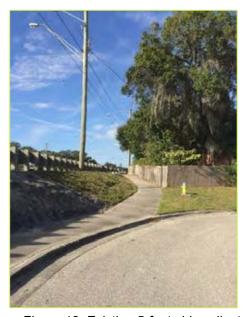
Existing 5-foot sidewalk at River Shore Drive and Hillsborough Avenue Bridge
